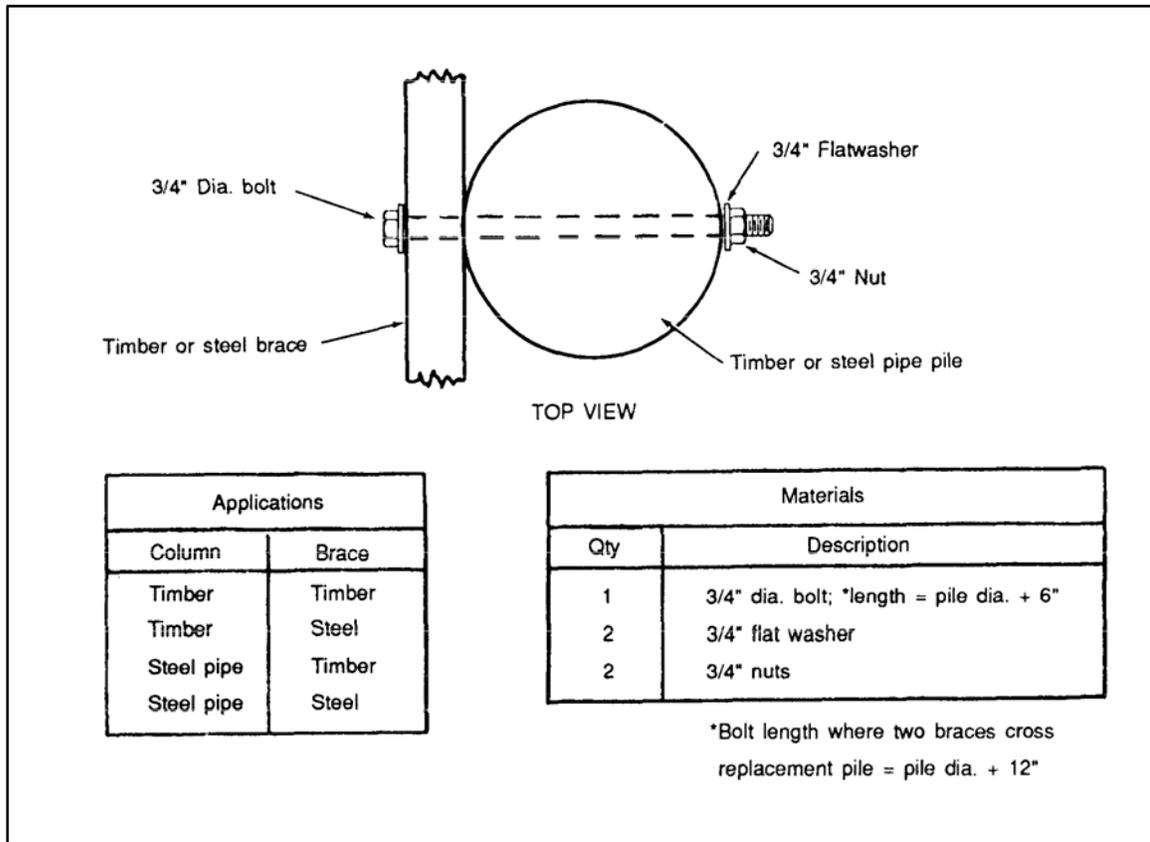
Brace connected to timber or steel pipe pile (bracing method 1)
